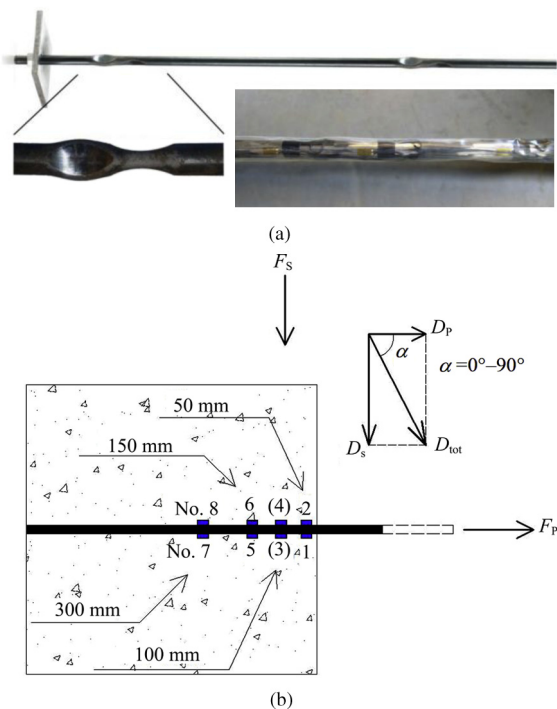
D-Bolt specimen and strain gauge layout. (a) Anchor detail and bolt shank with plastic pipe; (b) Strain gauge positions on the bolt.
